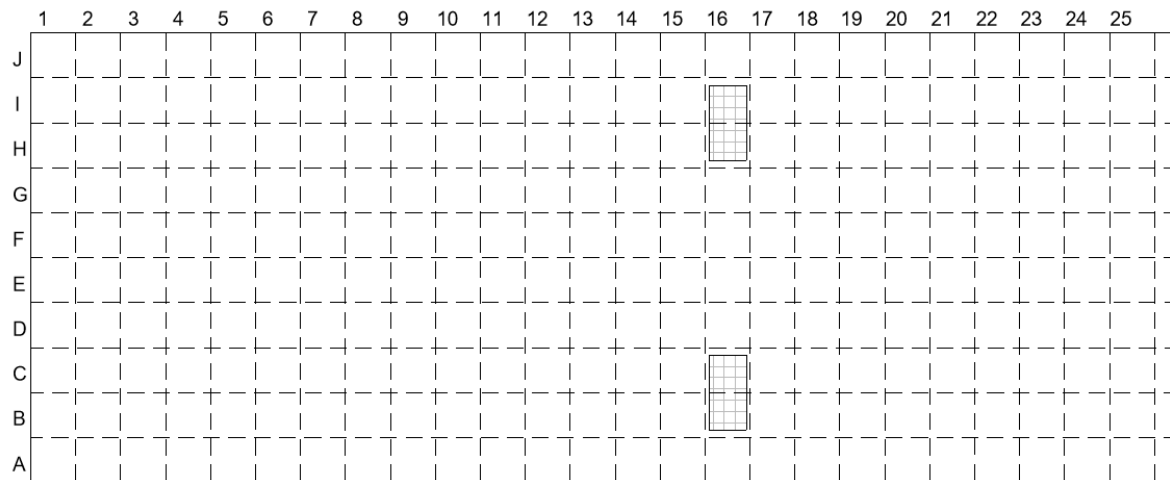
Gridded laboratory specimen for cracking documentation.
